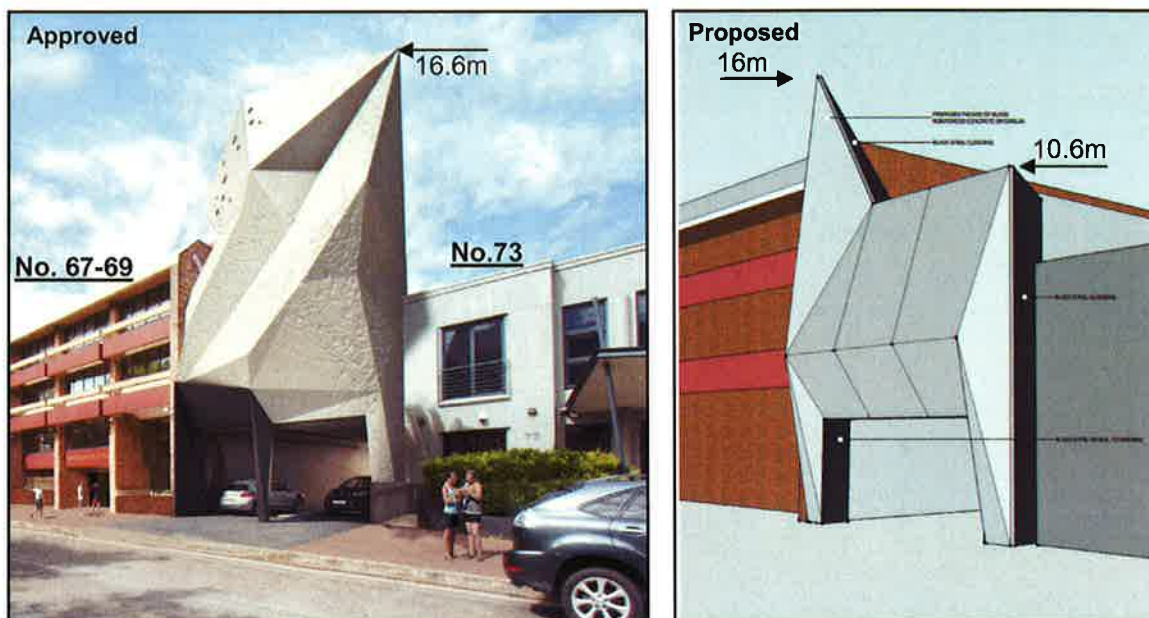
Perspective North-West view of approved and proposed Market Street façade
